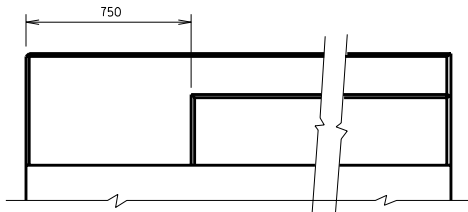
DETAILS OF DEFLECTION JOINTS IN PARAPET ONLY - SIMILAR TO THAT SHOWN IN THIS AREA
